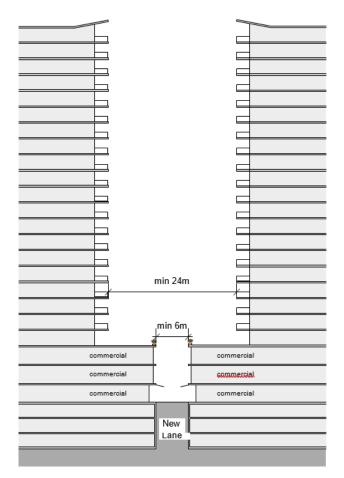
Setbacks to New Lane connecting Rawson Street to Beecroft Road
